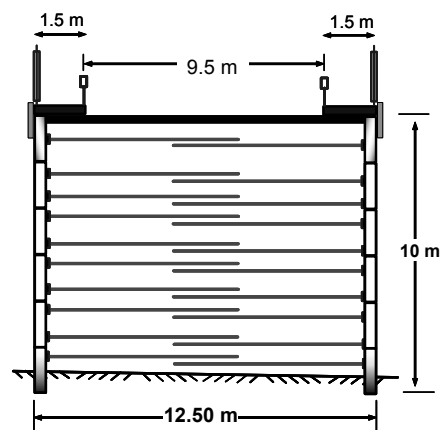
Schematics of the cross section of the reinforced wall system in Arifiye.
